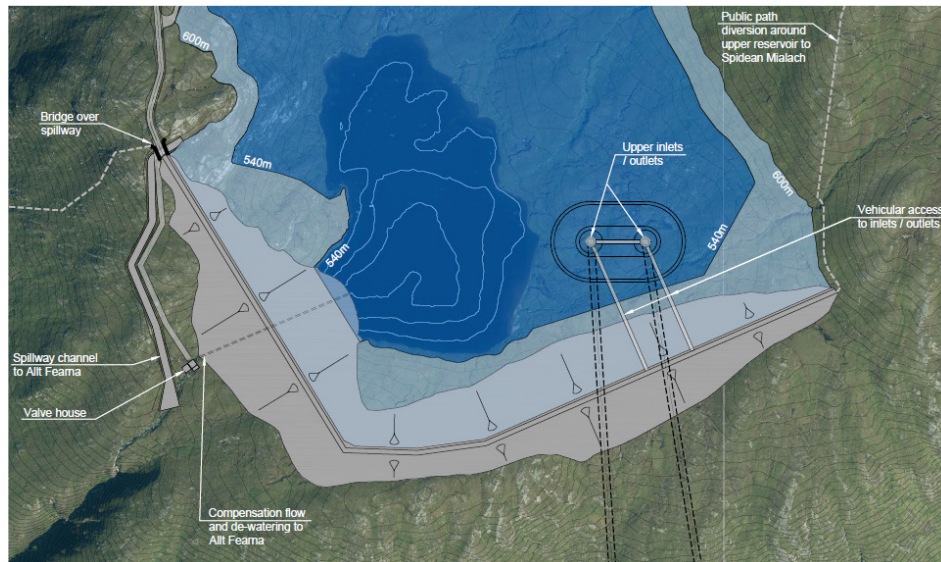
Preliminary Fearna Dam arrangement with straight edges
